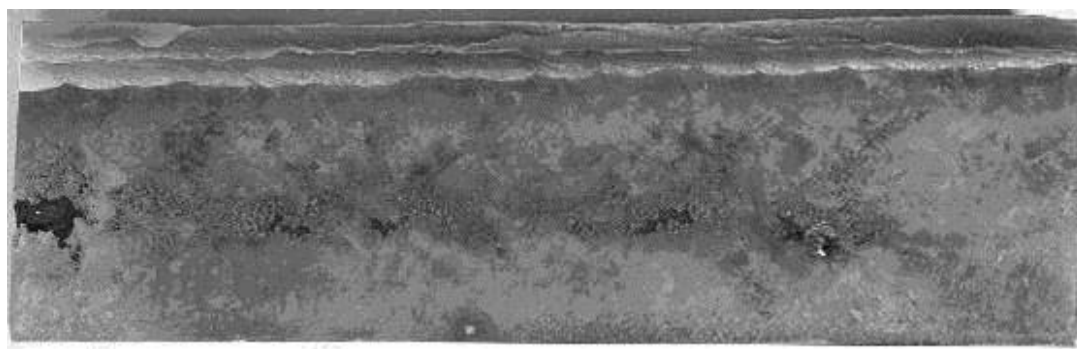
Spalling Damage in Cast AMS Crossing [3.2.58]
